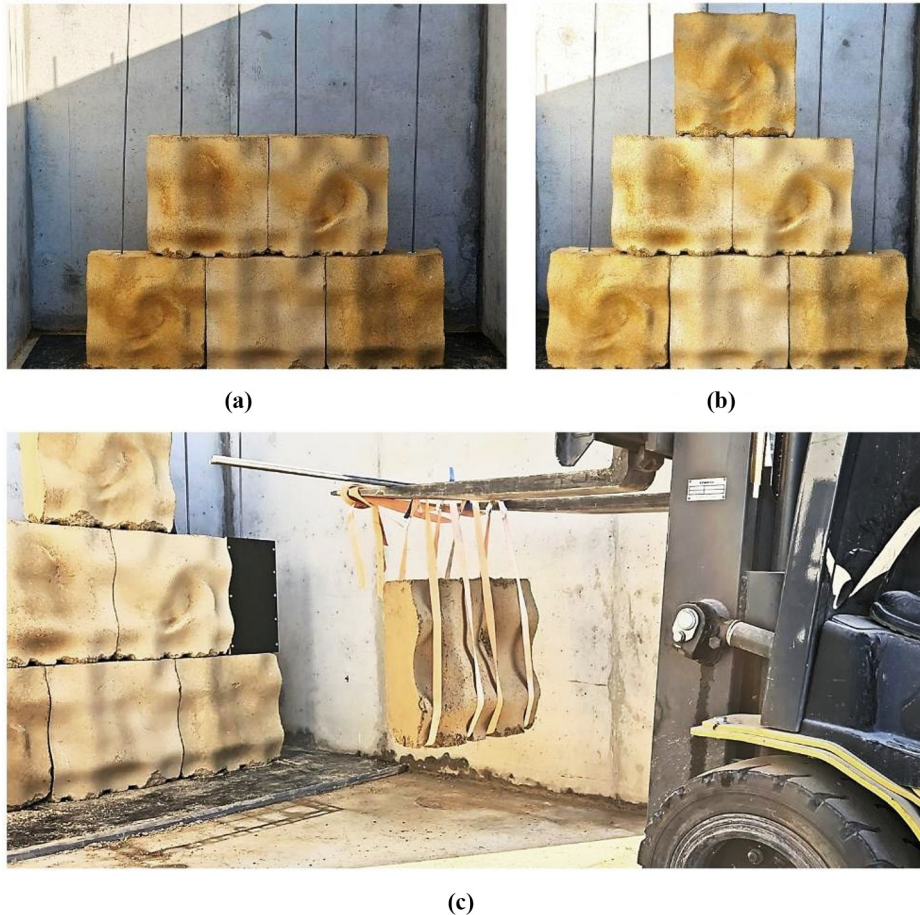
RE wall assembly process using mechanical lifting equipment: (a) first stage assembly showing bottom rows of blocks arranged in a triangular formation, (b) continued assembly with additional top block and (c) second stage assembly showing slings for safe handling
